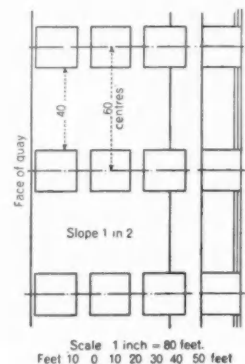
Horizontal Section showing Arrangement of Monoliths.
